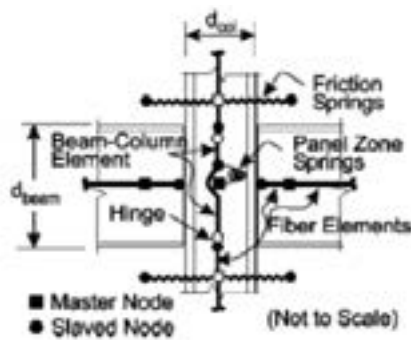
Numerical modeling of the typical PTED connection with PT and ED element (Rojas et al., 2005)
